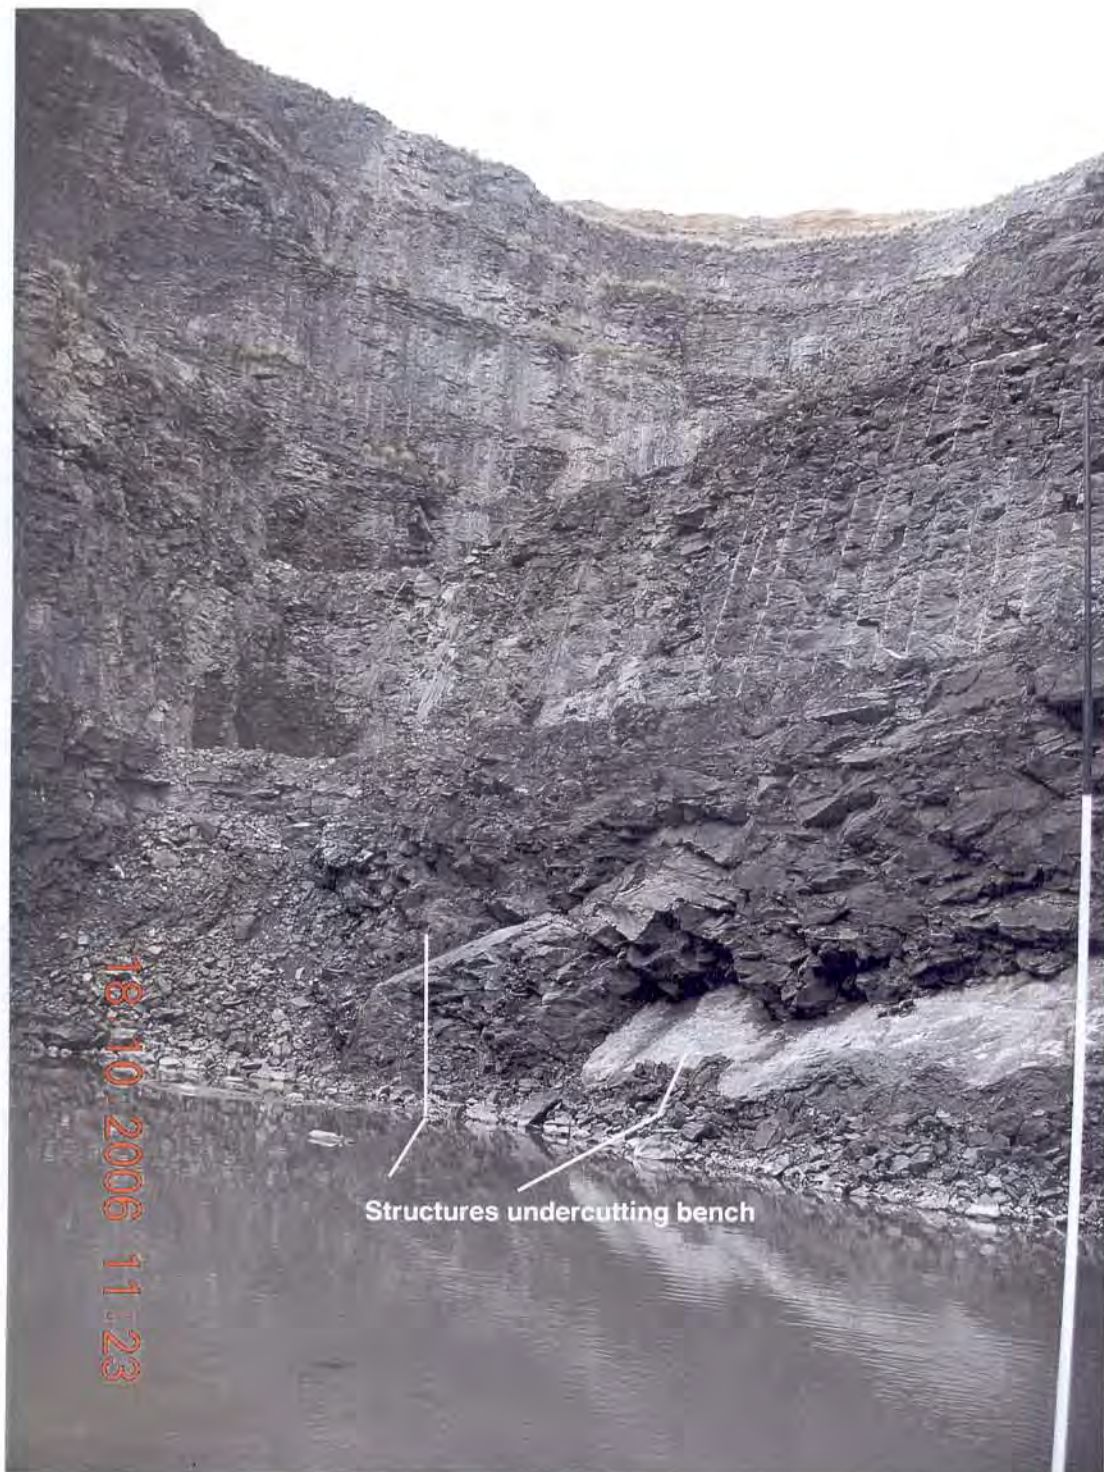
Lower east wall, highlighting structures undercutting lowest most bench. Loosening of structures will lead to failure of bench.
